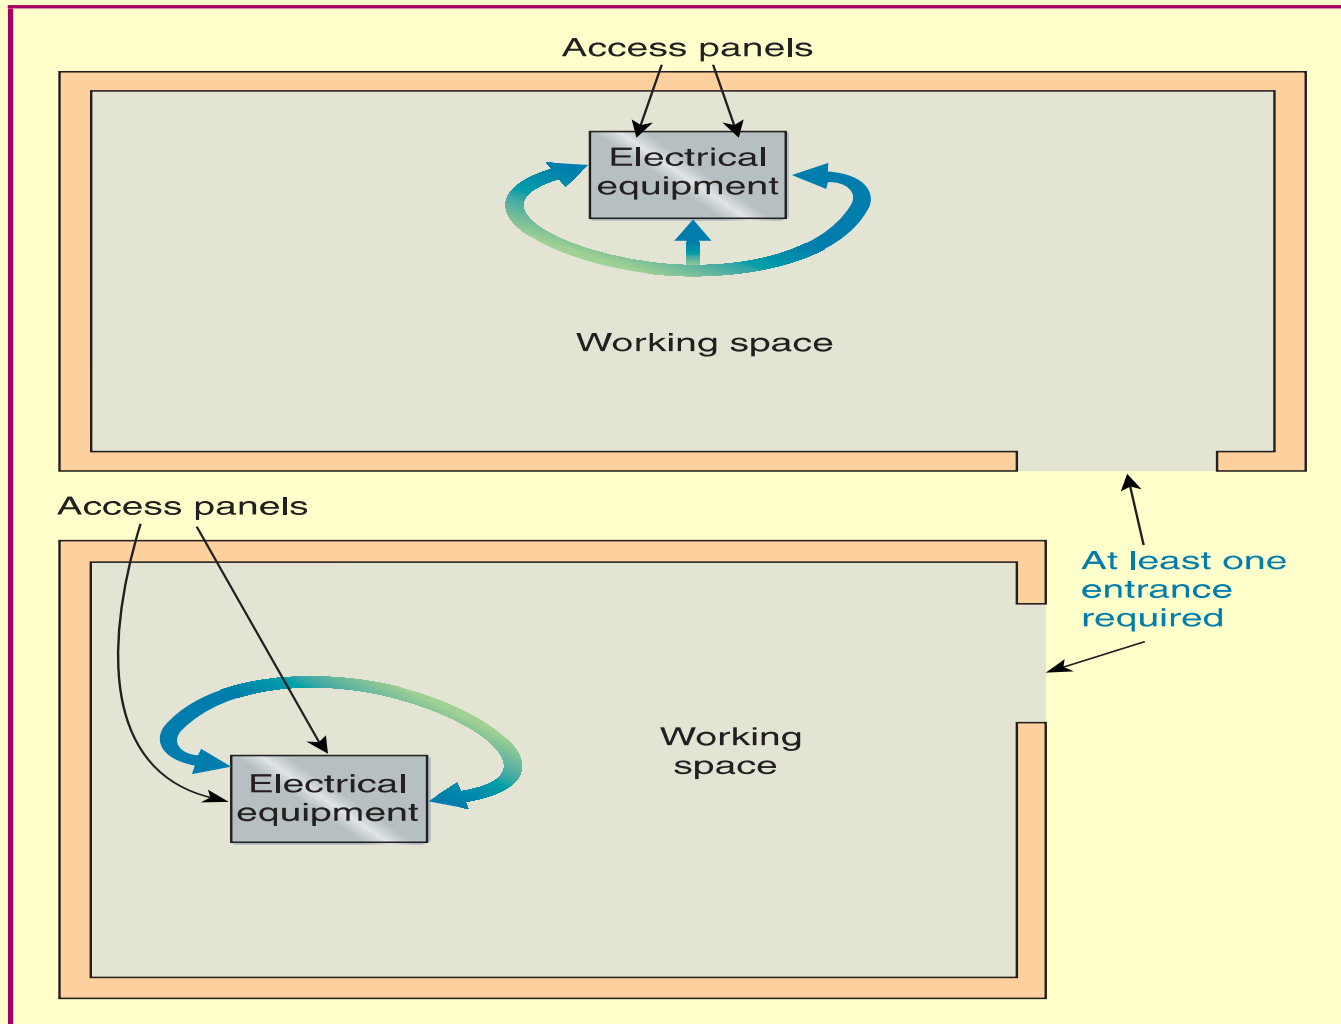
At least one entrance is required to provide access to the working space around electrical equipment.
